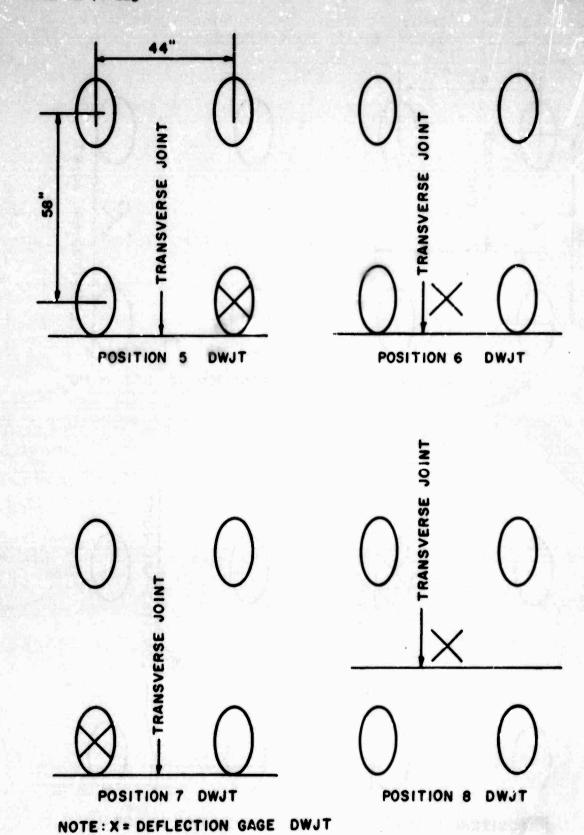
Wheel Positions 5-8 for Twin-Tandem Static Load Tests, Rigid Pavement Test Section
